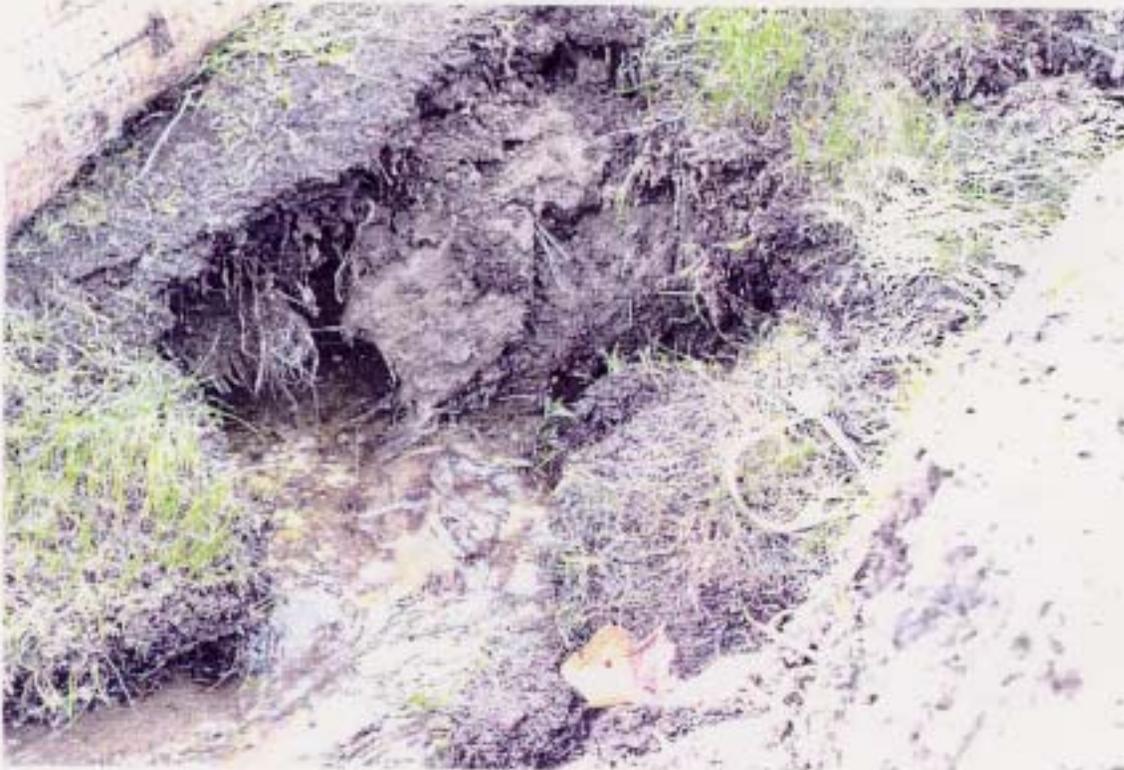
Close-up of water flowing north through eroded detention basin sidewall.
